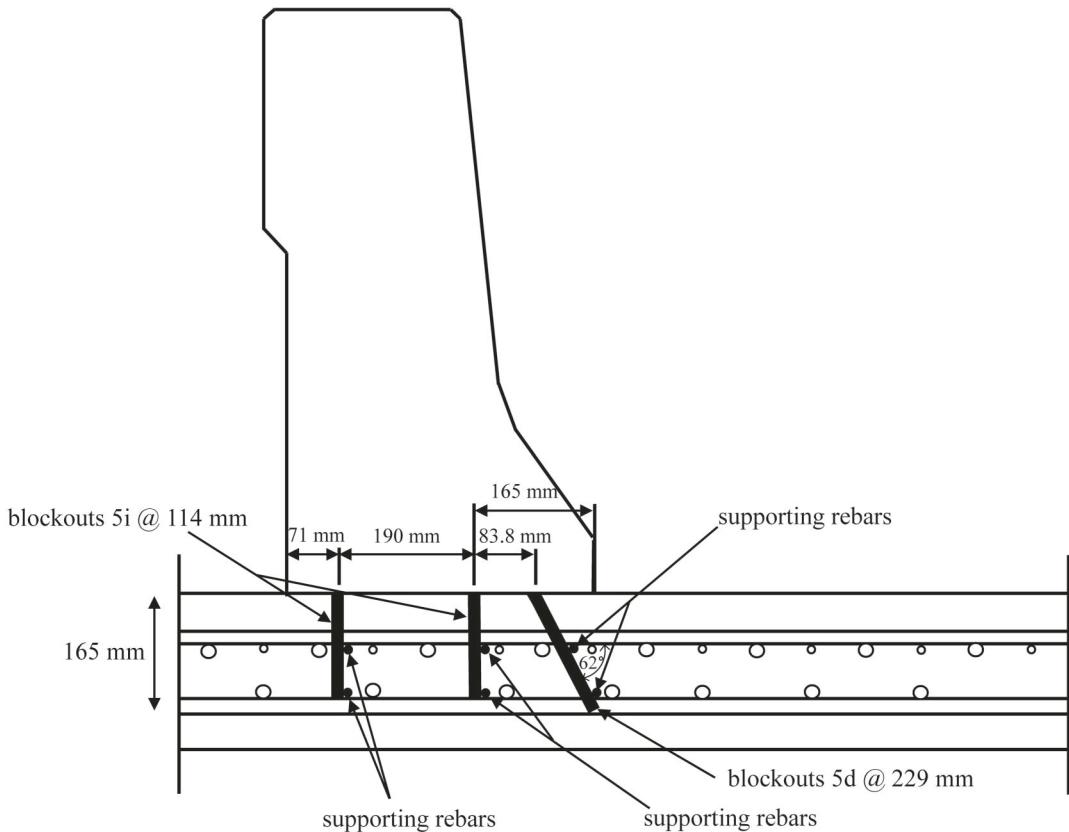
North side traffic railing original construction. (Data from [Rocchetti 2017](#).)
